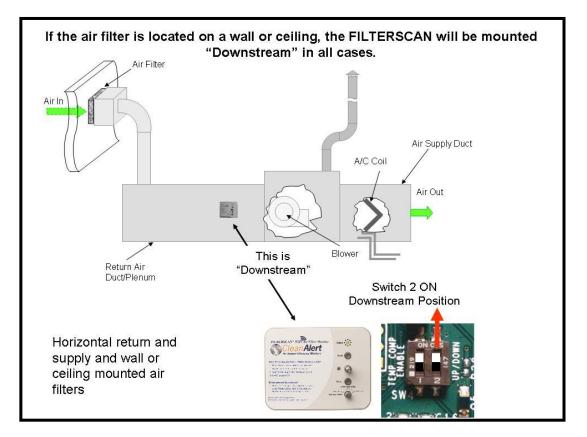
Installation on HVAC systems with wall or ceiling-mounted air filters
